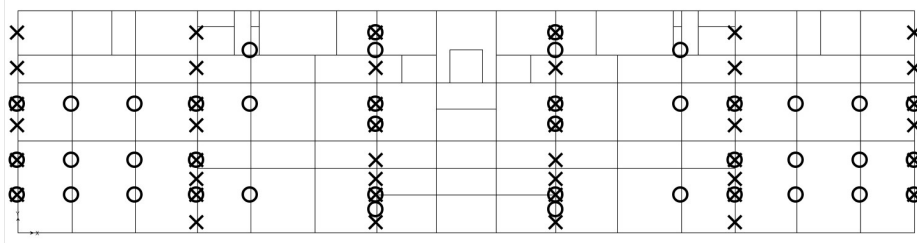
Damper Placement at 3rd floor (R-Y); MSSSA: 44 dampers;
